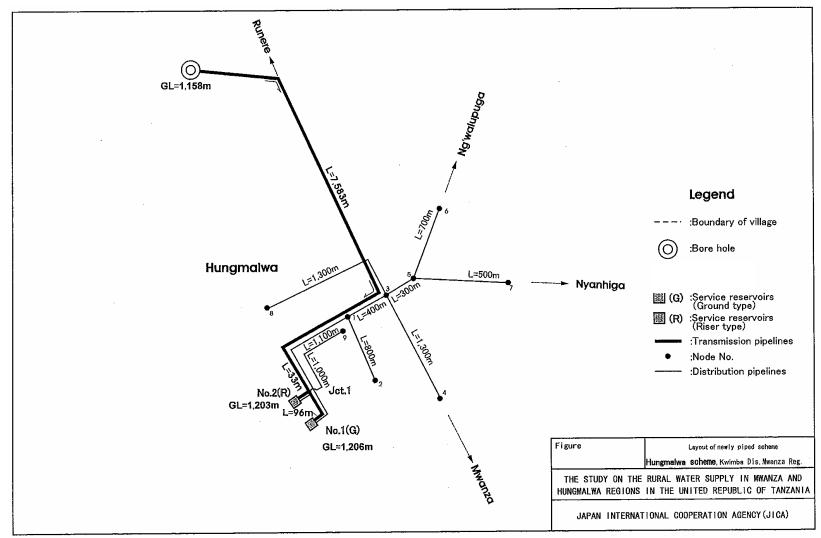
Layout of Newly Installed Piped Scheme (Hungumalwa Scheme)
